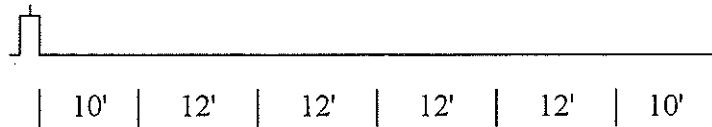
Configuration 0 -- Typical Roadway Section (1)
